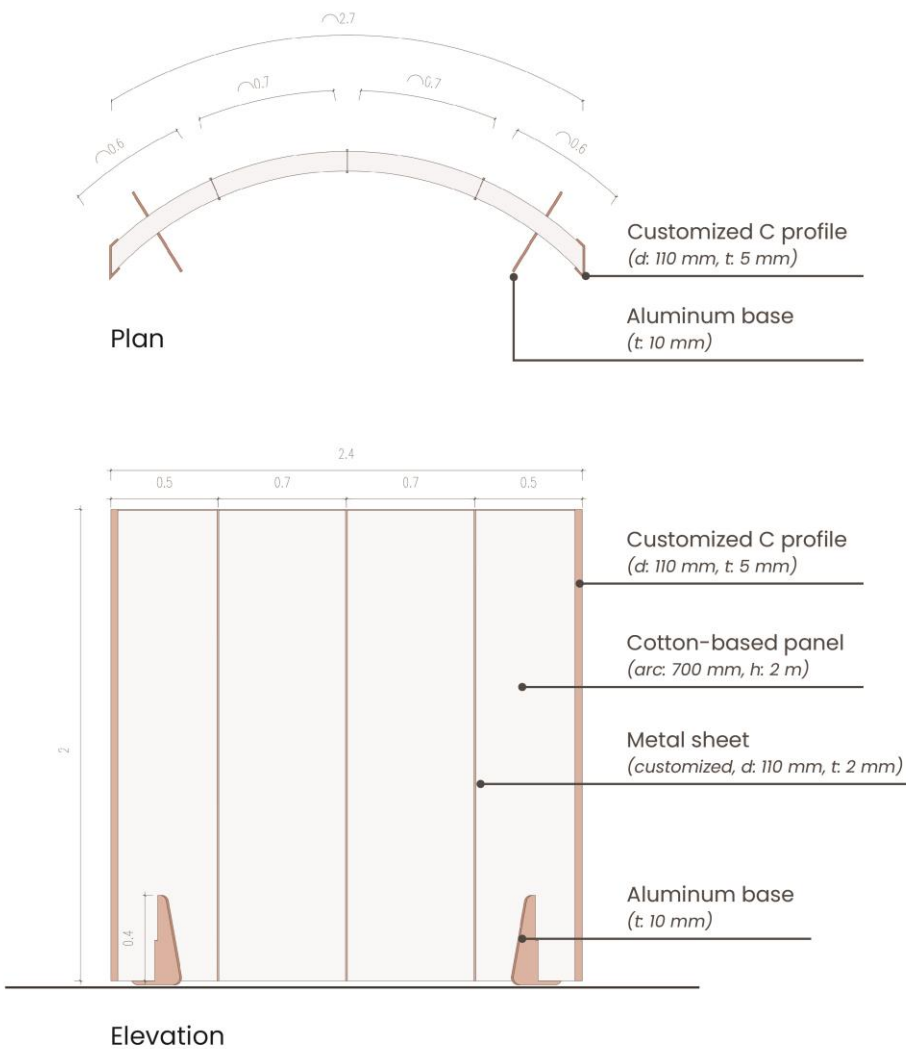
Plan and elevation views of the curved panels (Drawn by the author) Scale 1:40
